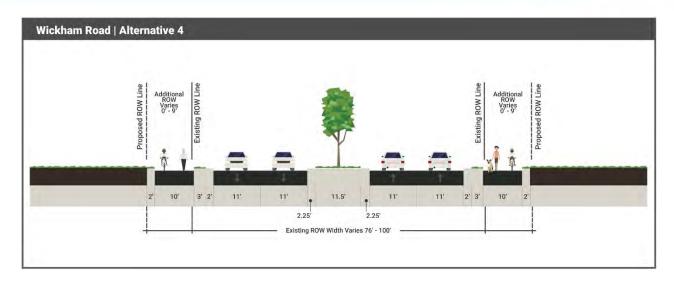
Wickham Road from Eau Gallie Boulevard to Lake Washington Road Typical Section Alternative 4
